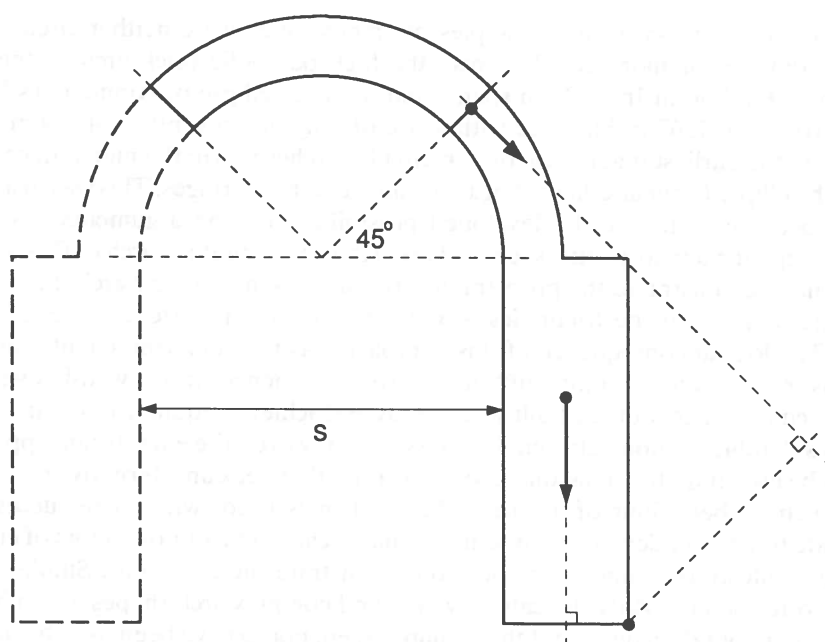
Bélidor's simplified version of Lahire's design procedure for masonry arch and abutment. Equilibrium of arch thrust and abutment weight about the outer edge of the abutment is considered.
